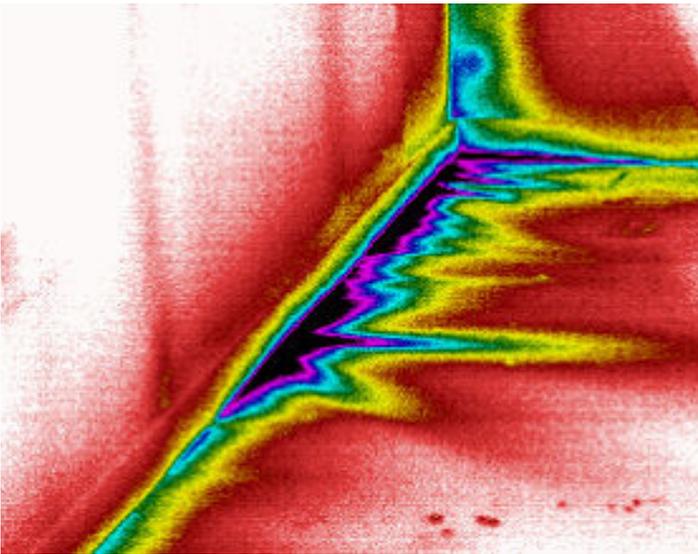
Infrared Photos of Air Leaks at the Base of a Wall
